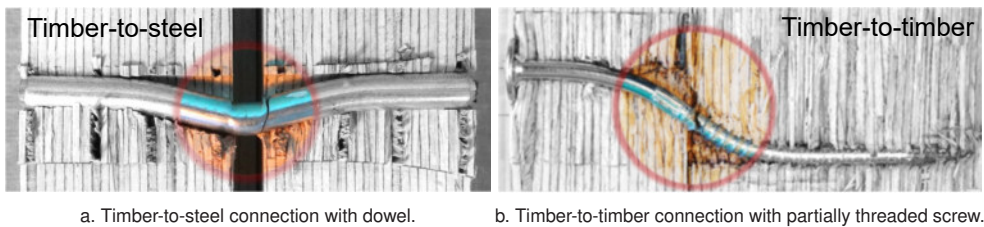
Exemplary fastener failure in shear planes of connections.
